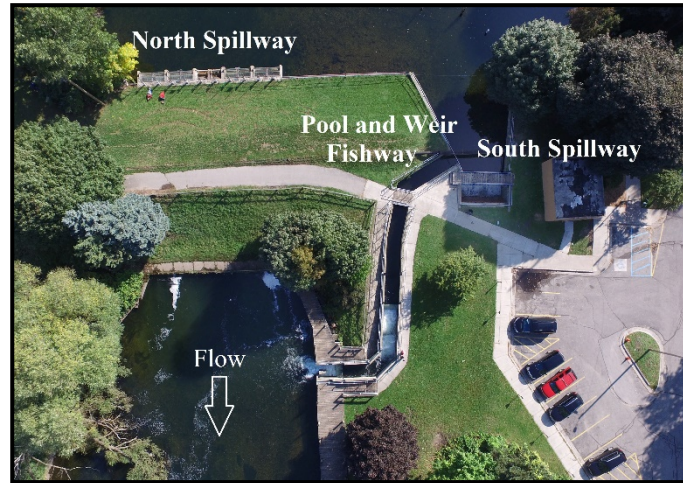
Aerial view of Union Street Dam. The south spillway outlet (not in view) is located immediately downstream of intake.
